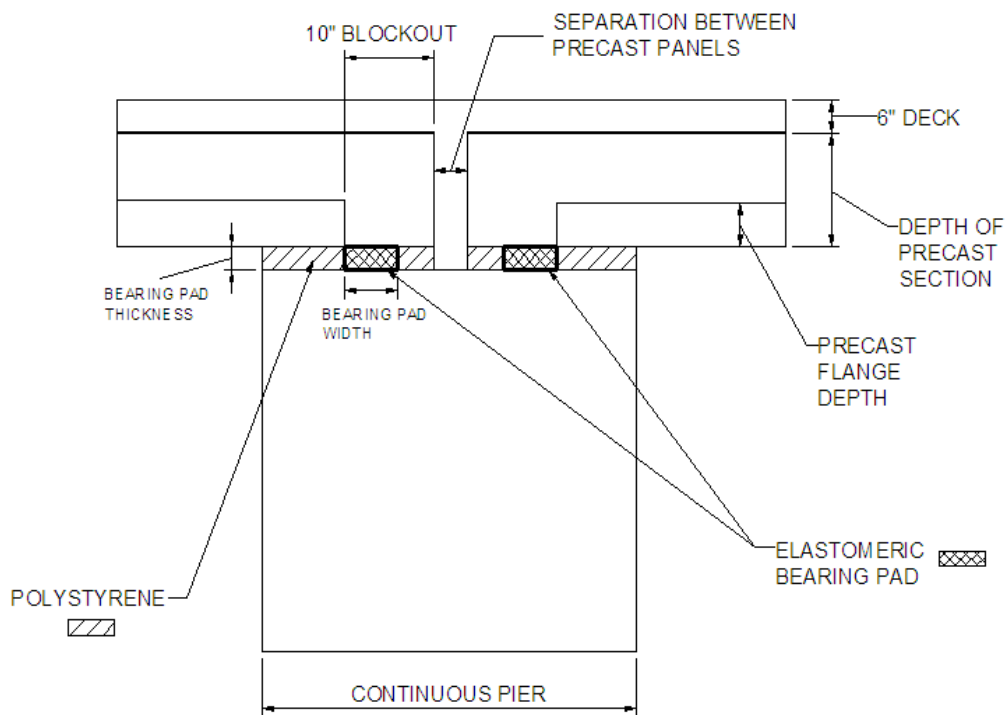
Cross-sectional view of a PCSSS and support at a continuous pier illustrating the 10 in. flange breakout and general bearing details
